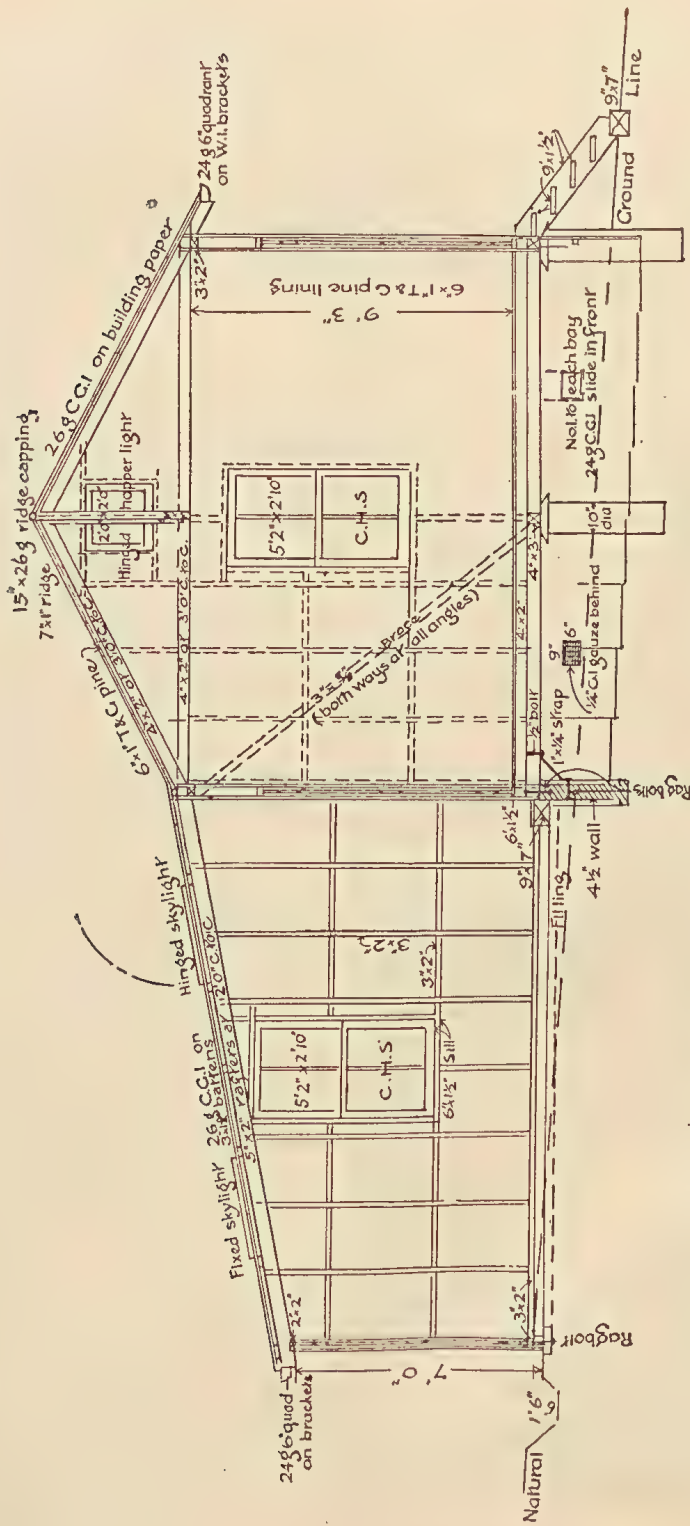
BULKING AND GRADING SHED (SECTION).
